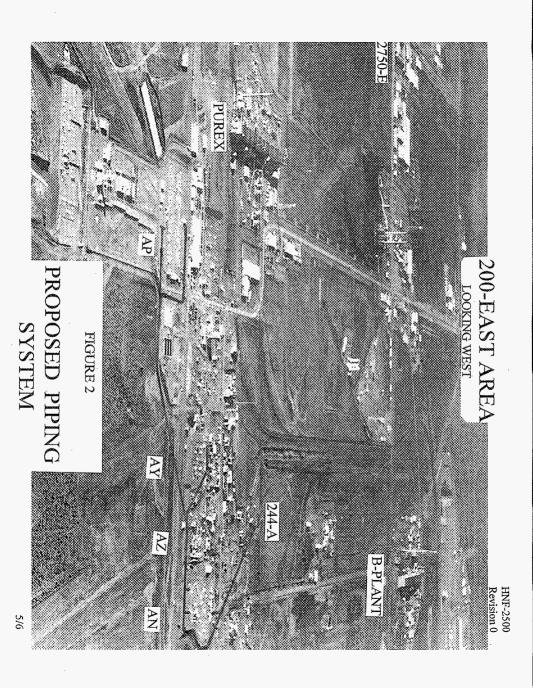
, 2, and 3 show the proposed piping system. The proposal calls for constructing the bulk of the new transfer system in nonradiological areas using the shortest and most direct routes available. The cross-site transfer lines are extended from a point just west of the 244-A lift station around the north and east sides of AN farm to tanks 241-AN-101 and -104 using a new above grade berm, and a new extension of the AN farm plateau. The high pressure cross-site line enters tank 241-AN-104, and the low pressure line enters the 241-AN-101 pump pit for connection to the existing AN farm transfer system. A new line runs directly from the 241-AN-104 pump pit to the 04D pit on tank 241-AP-104, the staging point for Low-Activity Waste (LAW) deliveries. New lines from the pump pits on tanks 241-AY-102, 241-AZ-101, and 241-AN-101 connect to a new valve pit just east of tank 241-AZ-101. Manifold jumpers in the new pit tie the lines to two direct transfer lines routed to the AP valve pit and to the privatization High-Level Waste (HLW) interface point just east of tank 241-AP-104. The three new lines to AP farm run parallel for 0.5 miles cross-country to the AP tank farm. The route crosses Canton Avenue on an earthen fill and continues around the east side of the 207-A retention basins to the northeast corner of the AP tank farm. In AP Farm, the lines separate to connect to the HLW vendor interface point, to the tank 241-AP-104 04D pump pit, and to the AN valve pit, respectively. The currently planned new Project W-314 pipelines connecting tank 241-AY-101 to tank 241-AY-102 and tank 241-AZ-102 to tank 241-AZ-101 are retained, as are most of the AN valve pit upgrades. The currently planned
